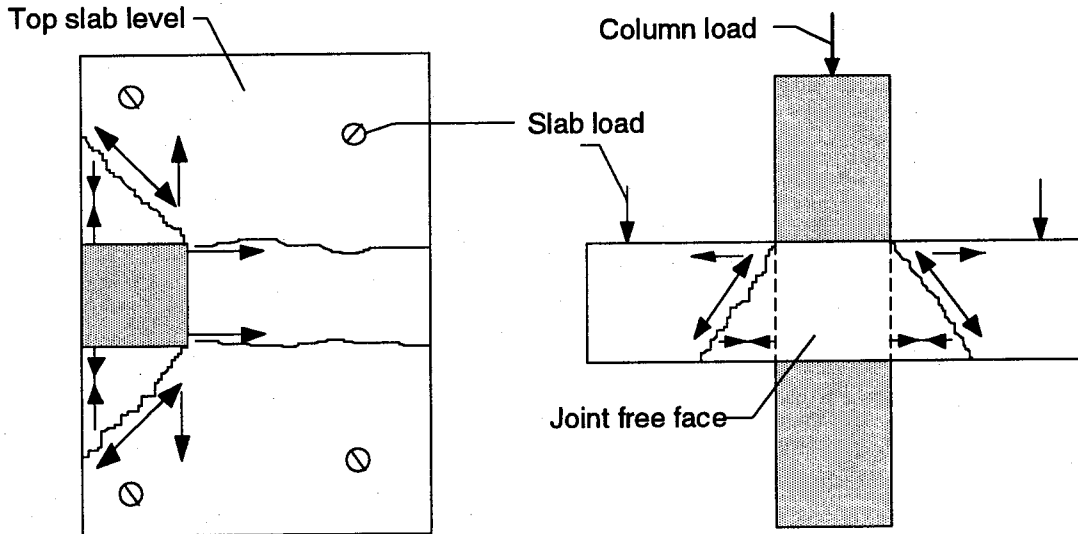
Forces Acting over an Edge Slab-Column Joint with Slab Loads
